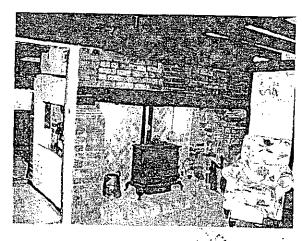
Room 3, lounge. Inglenook fireplace to north elevation
